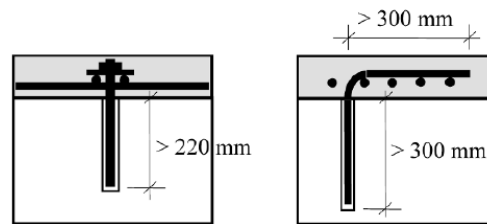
Headed studs and rebar as shear connectors of concrete-to-concrete interfaces (extracted from [36])
